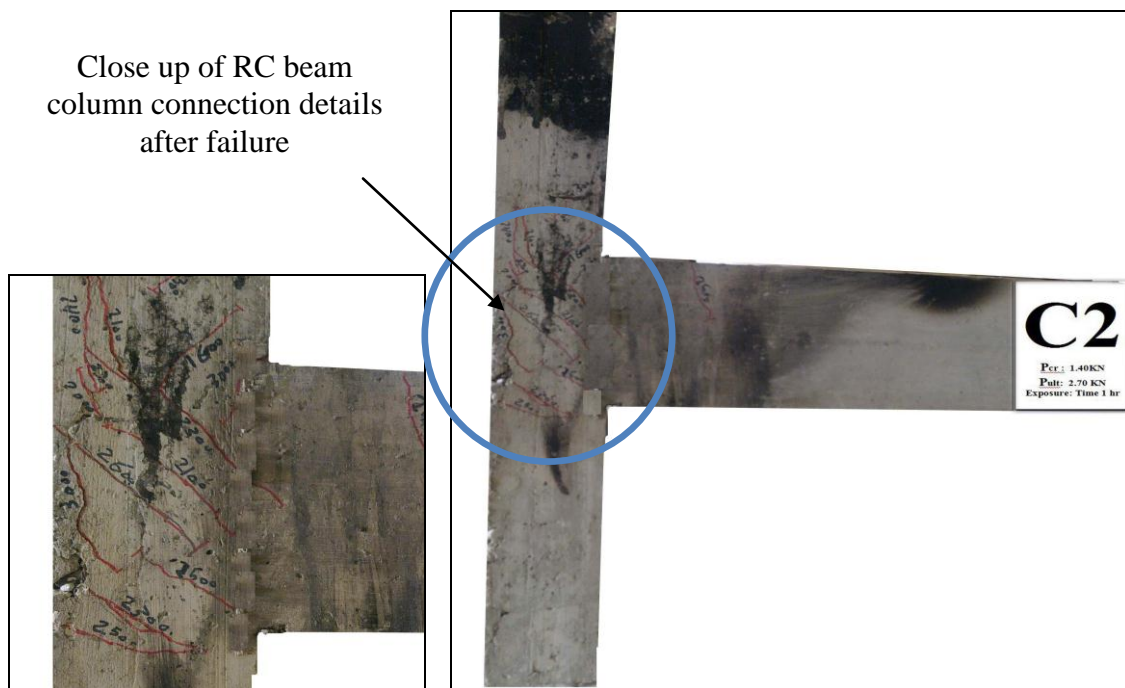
Crack Pattern of Specimen C2 at 600°C for 1hr
